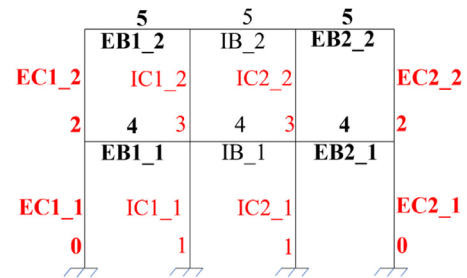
Indexing columns and beams for a 2-storey reference building.
